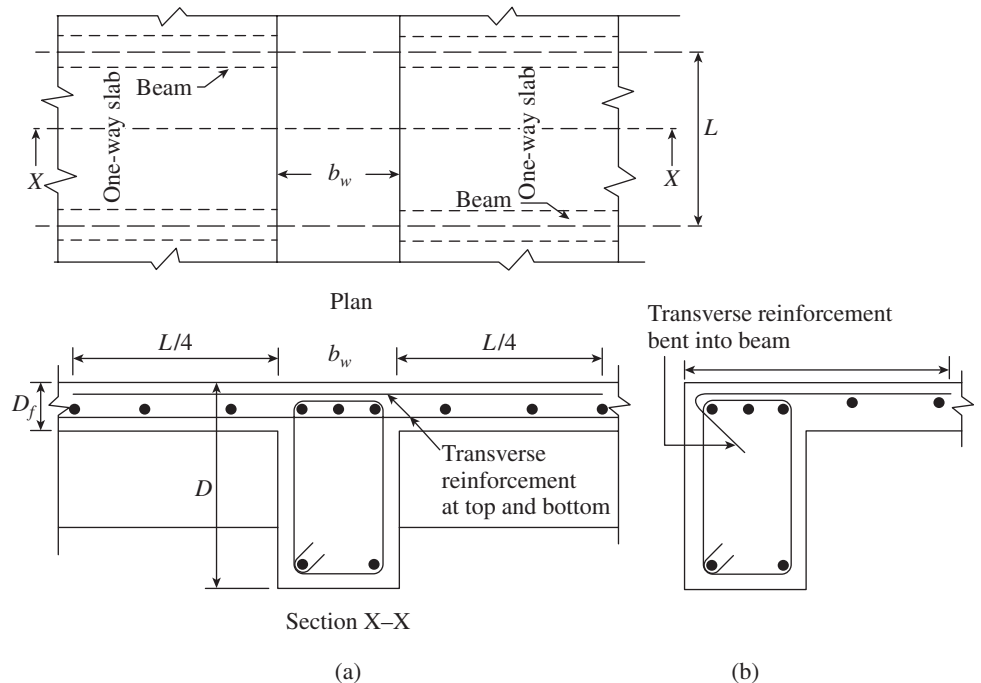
Transverse reinforcement in flanges of T-beams (a) Internal beam (b) External beam
